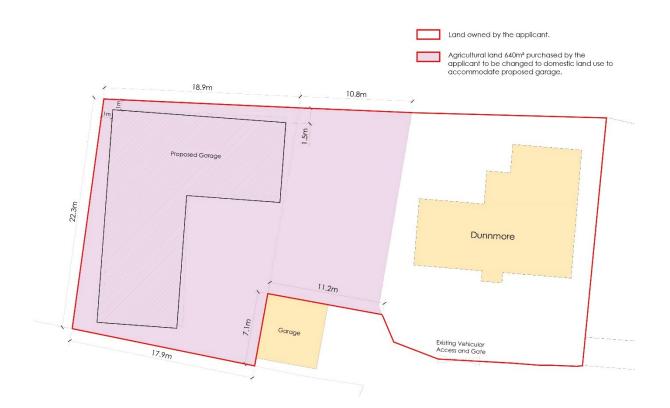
Site plan from application 20/01205/FLL where the pink area is formerly agricultural land that has been changed in use to garden ground. As can be seen from the site plan the footprint of the garage is much larger than that of the house.
